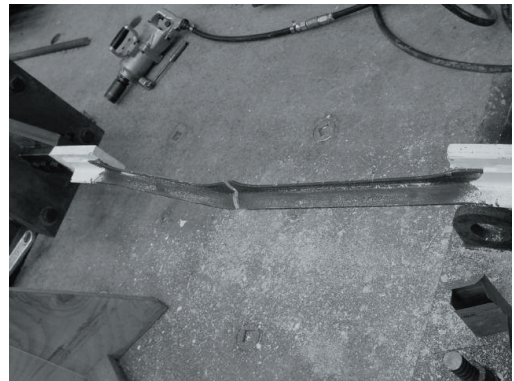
Fracture of single-angle specimen with welded connections.
